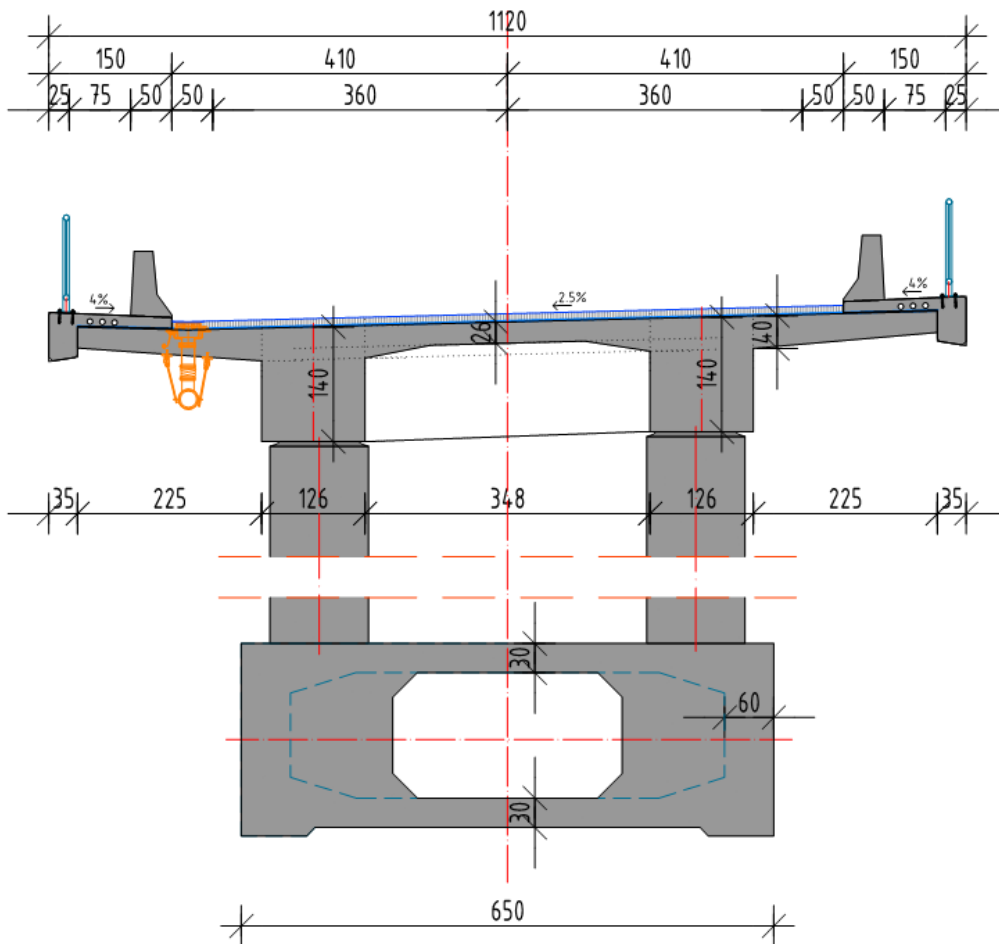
Detail cross-sections showing; variable arch box cross-section from spring 700/270 cm to crown 600/150 cm; concrete hinge detail at arch piers. (Source: DEL ING d.o.o., PGD drawings, 2025)
